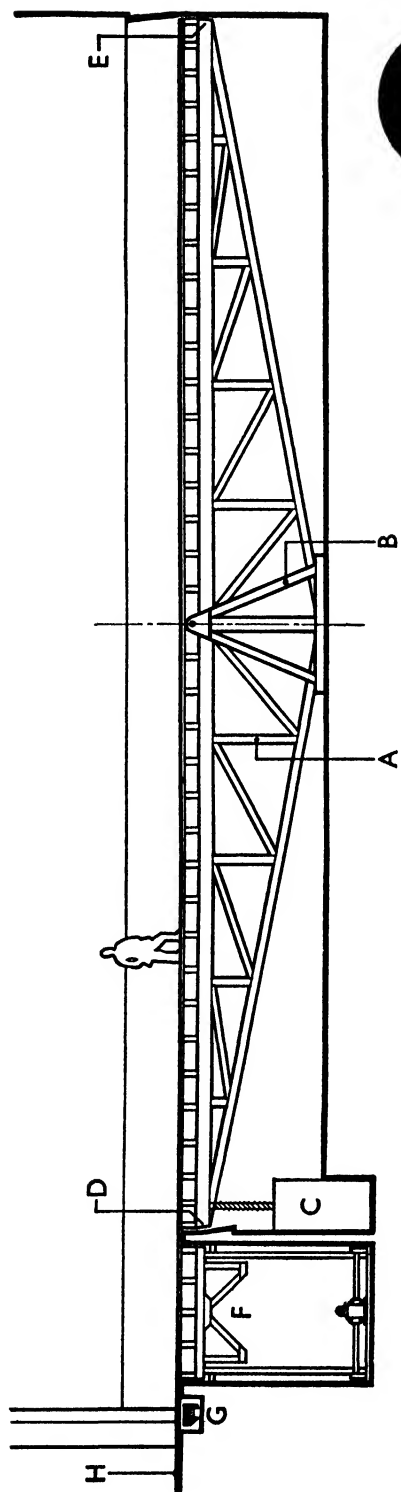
A Scheme for a Dual-purpose Auditorium Floor. (A) Steel trusses to carry multi-purpose floor. (B) Brackets on which floor is pivoted. (C) Screw and motor for varying slope of floor. (D and E) Locking bolts to ensure rigidity. (F) Variable floor to orchestra well. (G) Disappearing footlights. (H) Stage.
